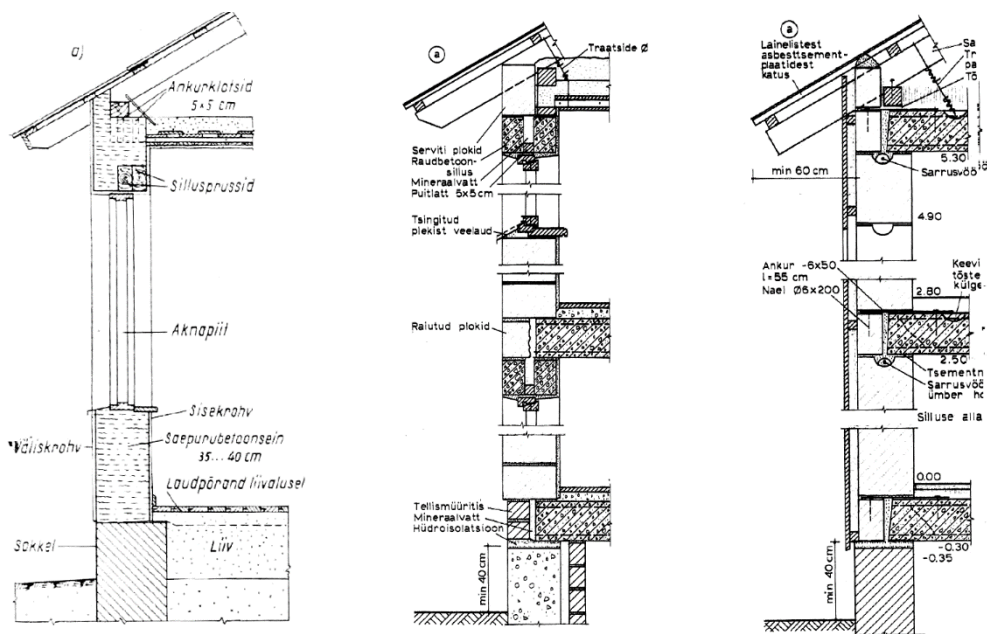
Examples of concrete structures (left to right: saw-dust concrete wall (Veski, 1969), small aerated concrete block structure (Masso, 2022), large aerated concrete block structure (Masso, 2022))
